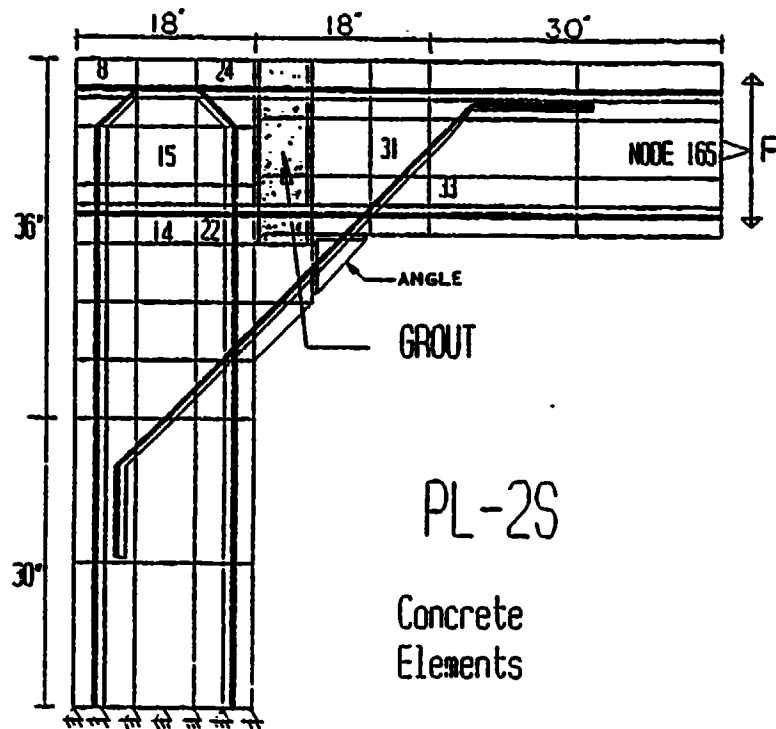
Connection detail PL-2S with labeled concrete and steel reinforcement elements.
